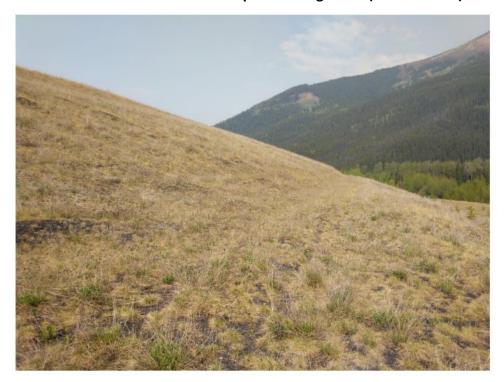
BTD Downstream Slope – looking west (BTD-2019-13)
